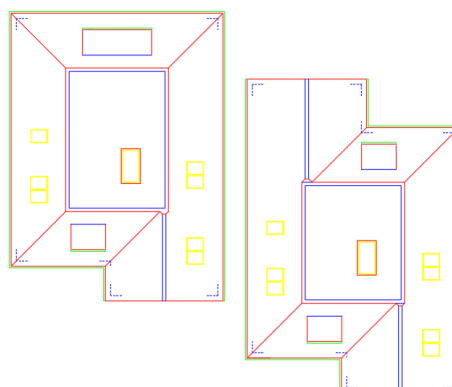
showing the roof plan with the location of proposed roof lights shown.
